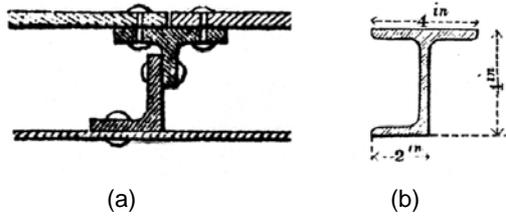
(a) Initial design for stiffeners fabricated from built-up sections. (b) Fairbairn's proposal to have special section rolled to eliminate need for expense of built-up sections. May 1846. (Fairbairn¹)
